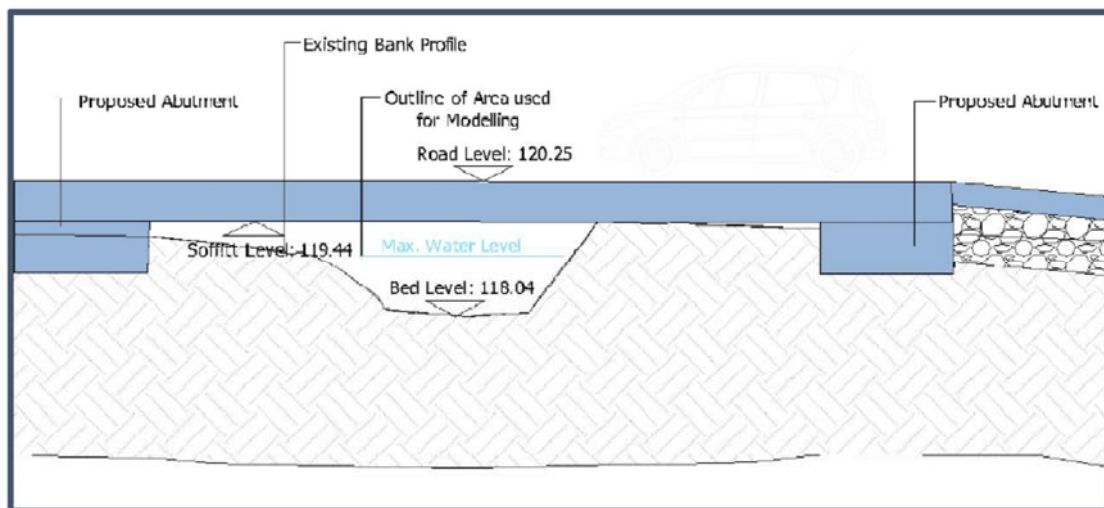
Extract from SSFRA fig.5.8 - Typical section at Stream Crossing
